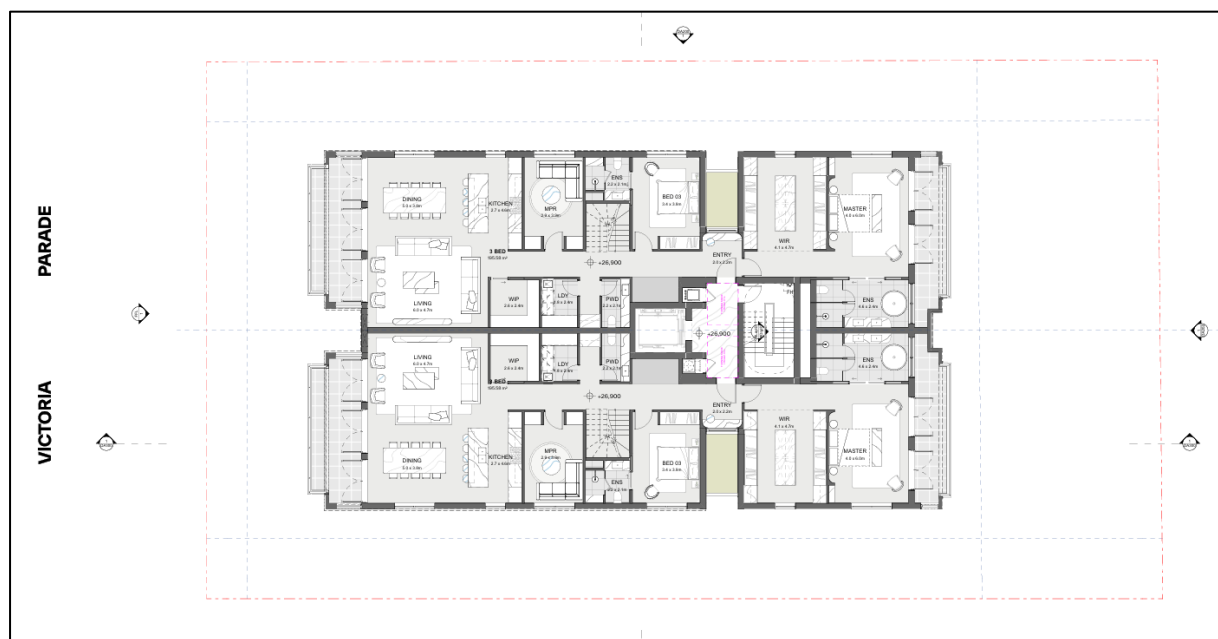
Floor Plan for Level 7 (Source: PBD Architects, 2026)
